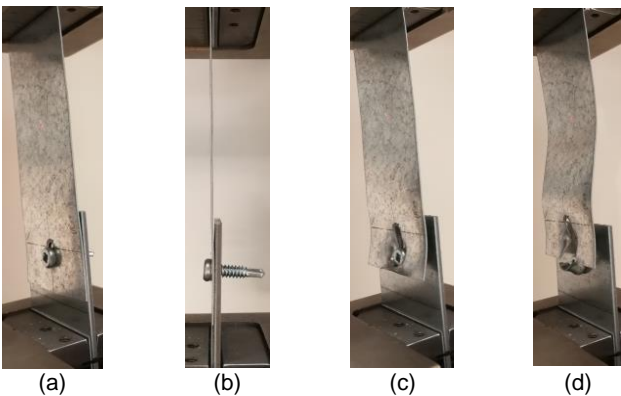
Deformation and failure of a “97-12-30” test with thin sheet buckling towards the fastener head: (a) Peak strength level front view;
